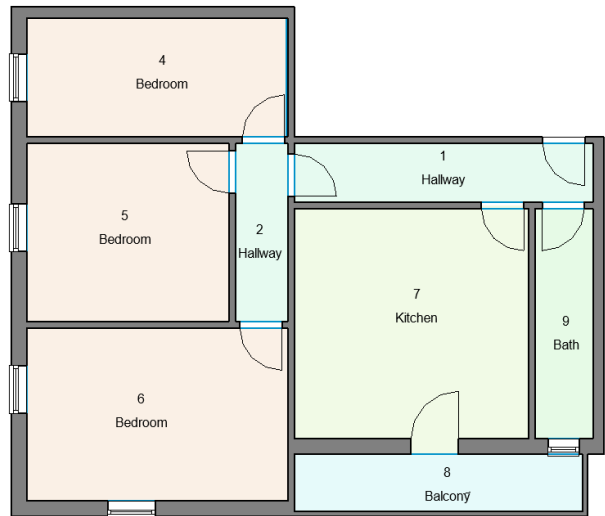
Plan of the apartment chosen as a study case, before the restructuring intervention.
